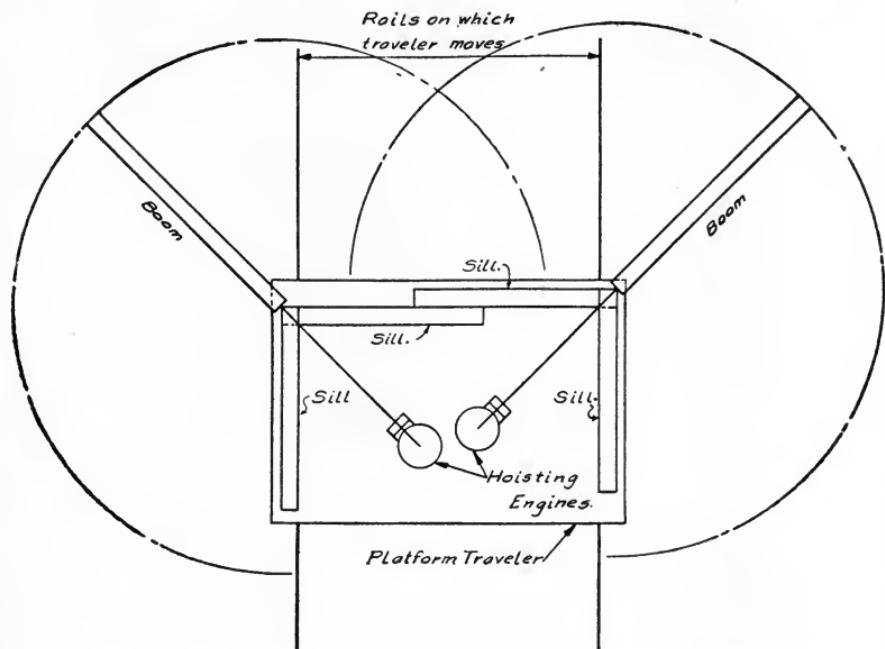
Plan of Layout for Two Stiff-Leg Derricks on Movable Platform
